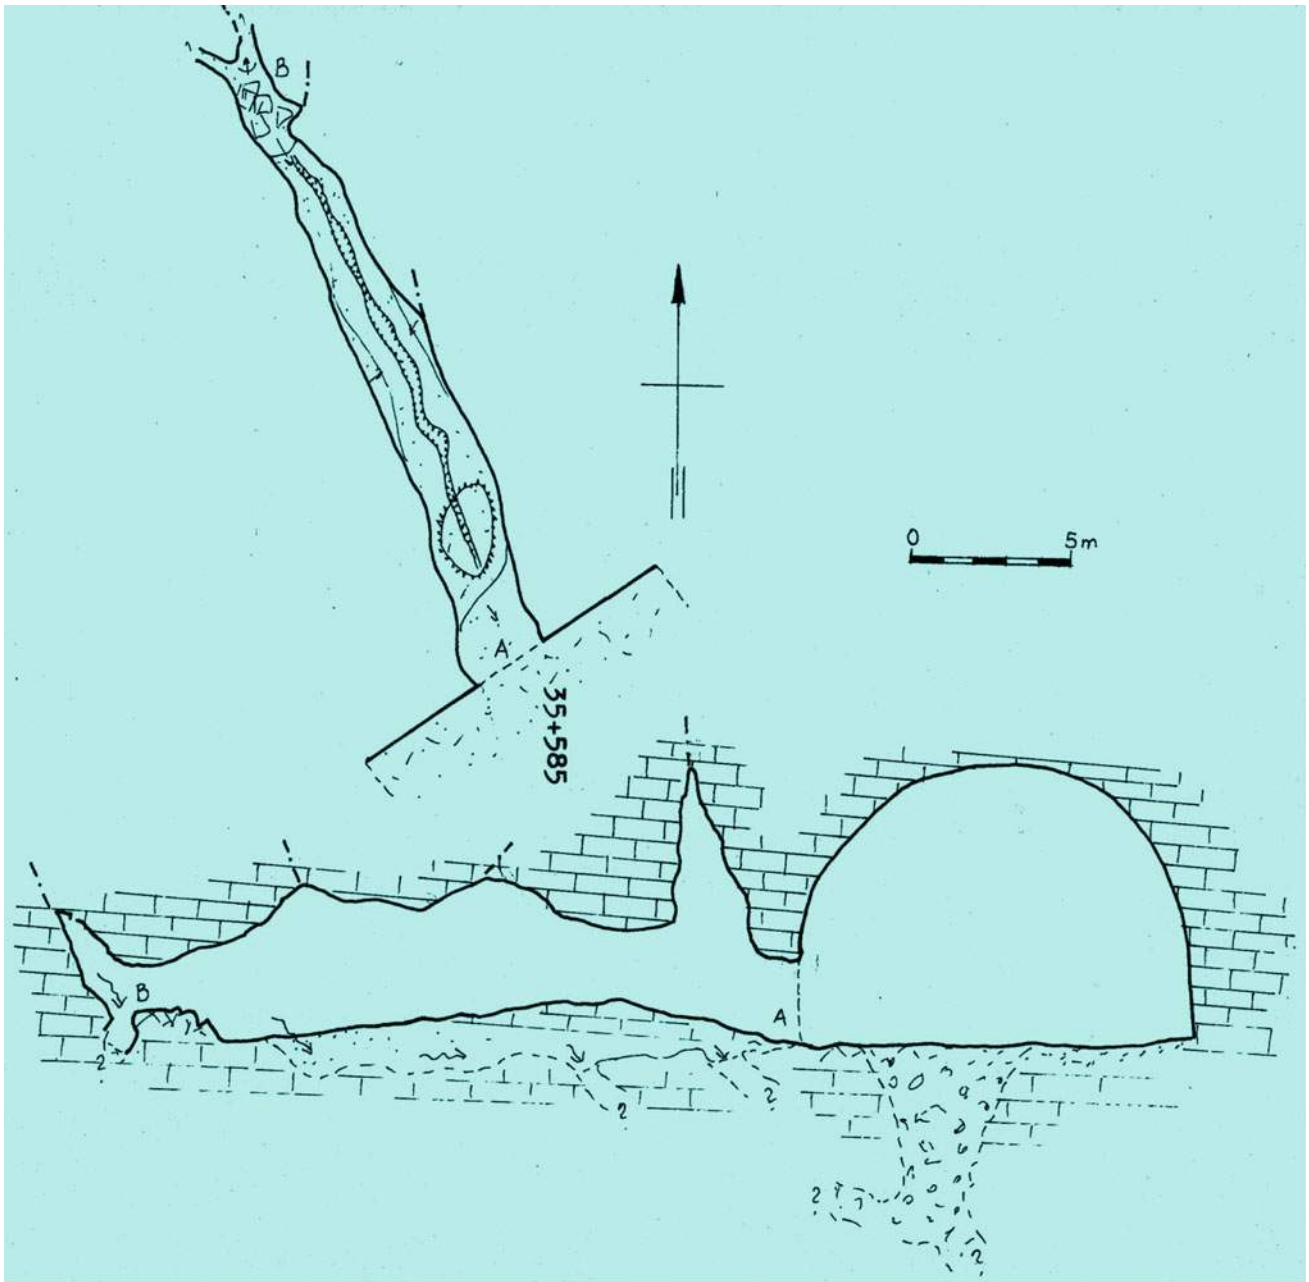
Profile and plan of cavern at km 35 + 585 in Sleme Tunnel
